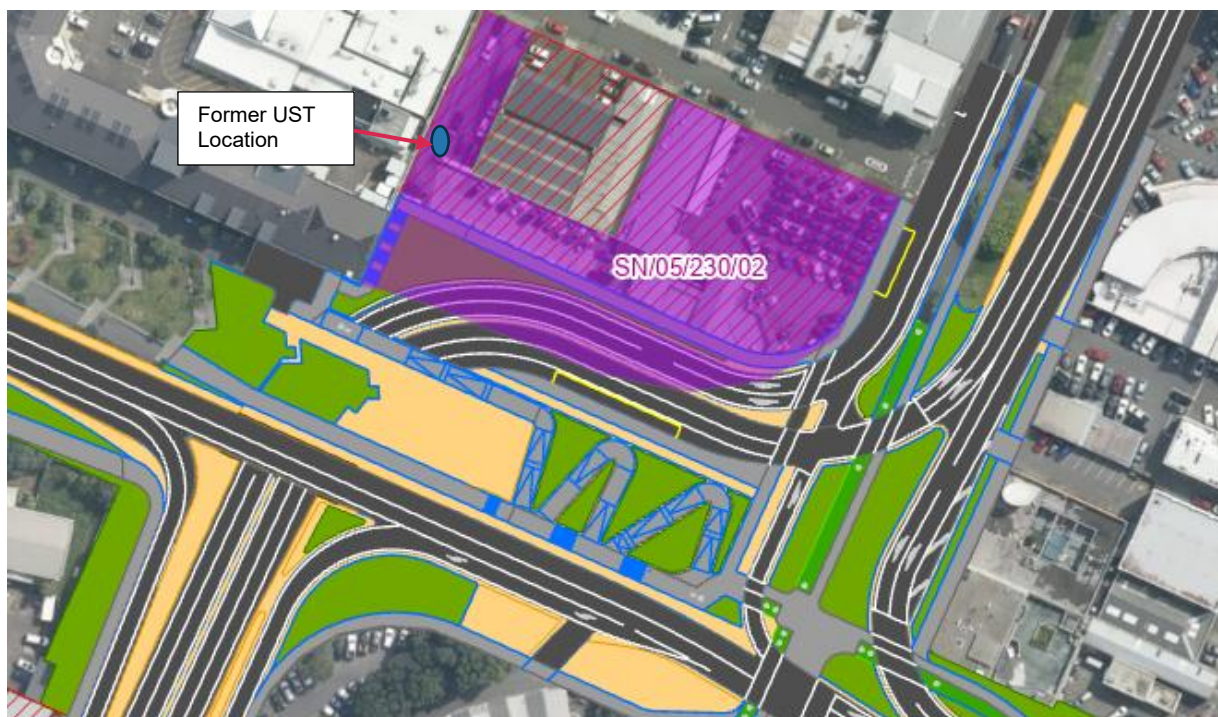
Plan of the Sussex Street to Cambridge Terrace Connection through Gazley Mitsubishi
